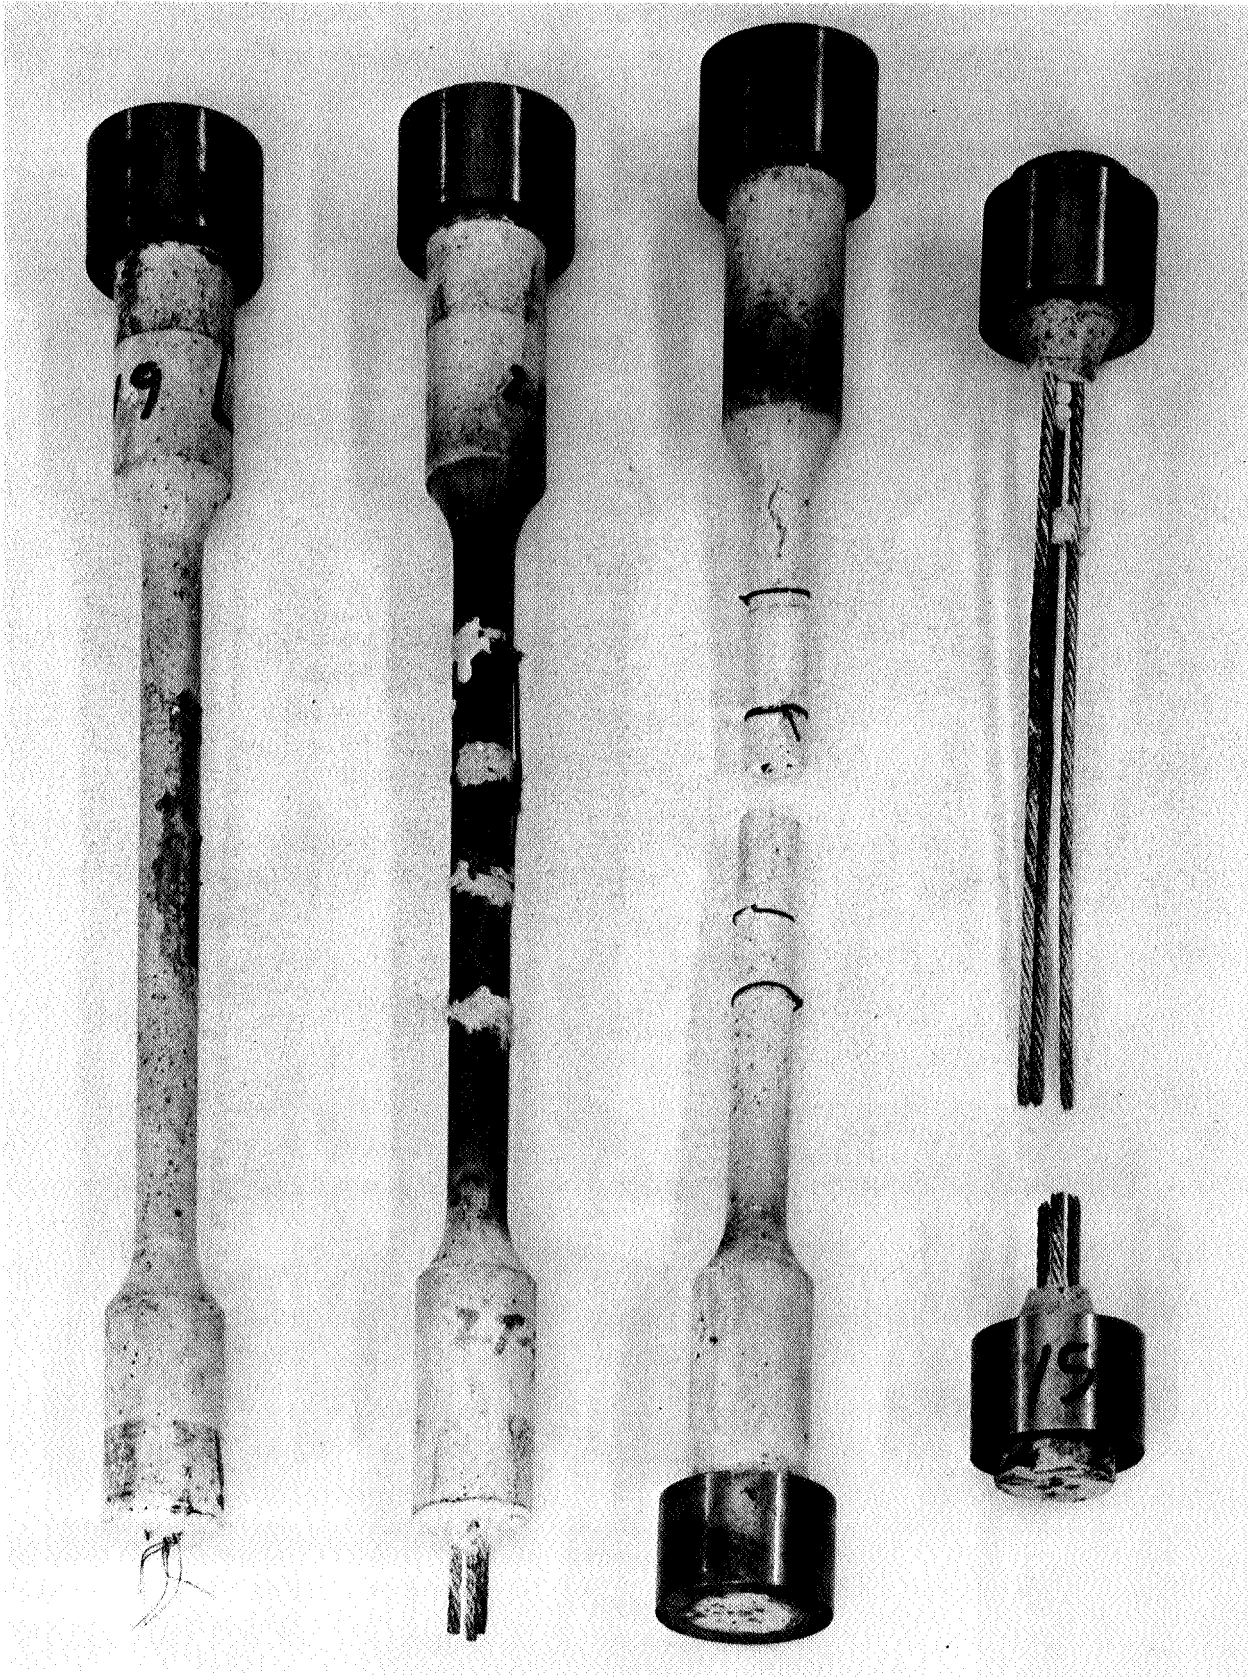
Failure Modes of Prestressed Tensile Specimens
